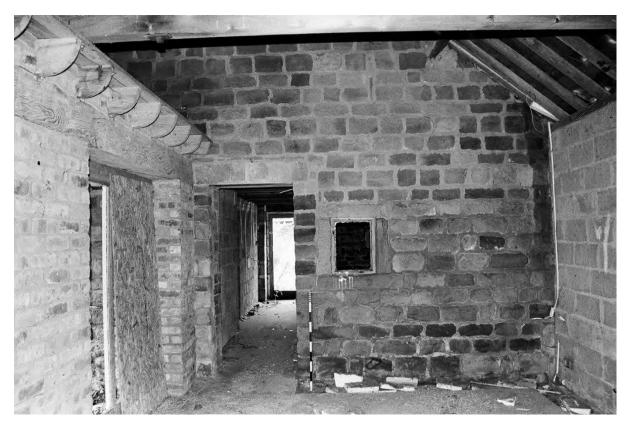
Farm Building 4: Rooms 4.1 & 4.3 (Film 7/12). Facing West.
